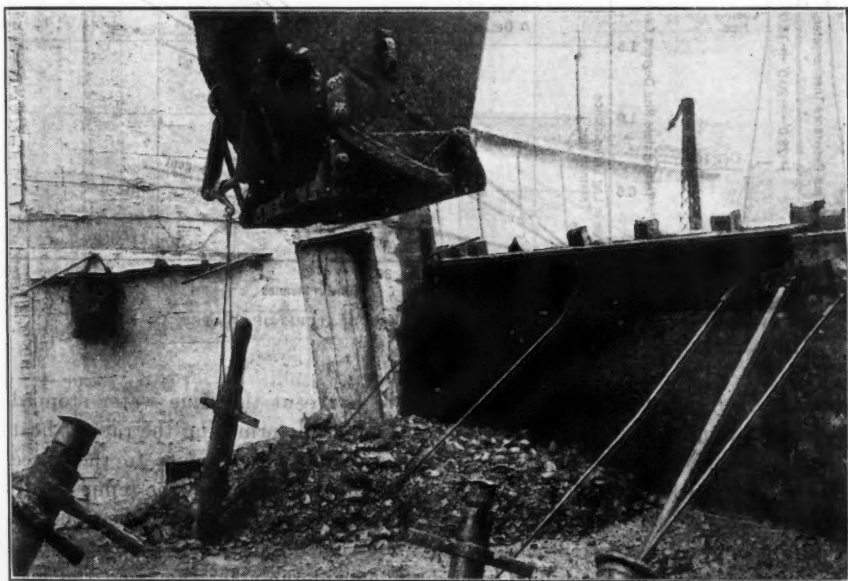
FIVE-INCH HOLLOW RUBBER CONDUIT BEING RAISED.
